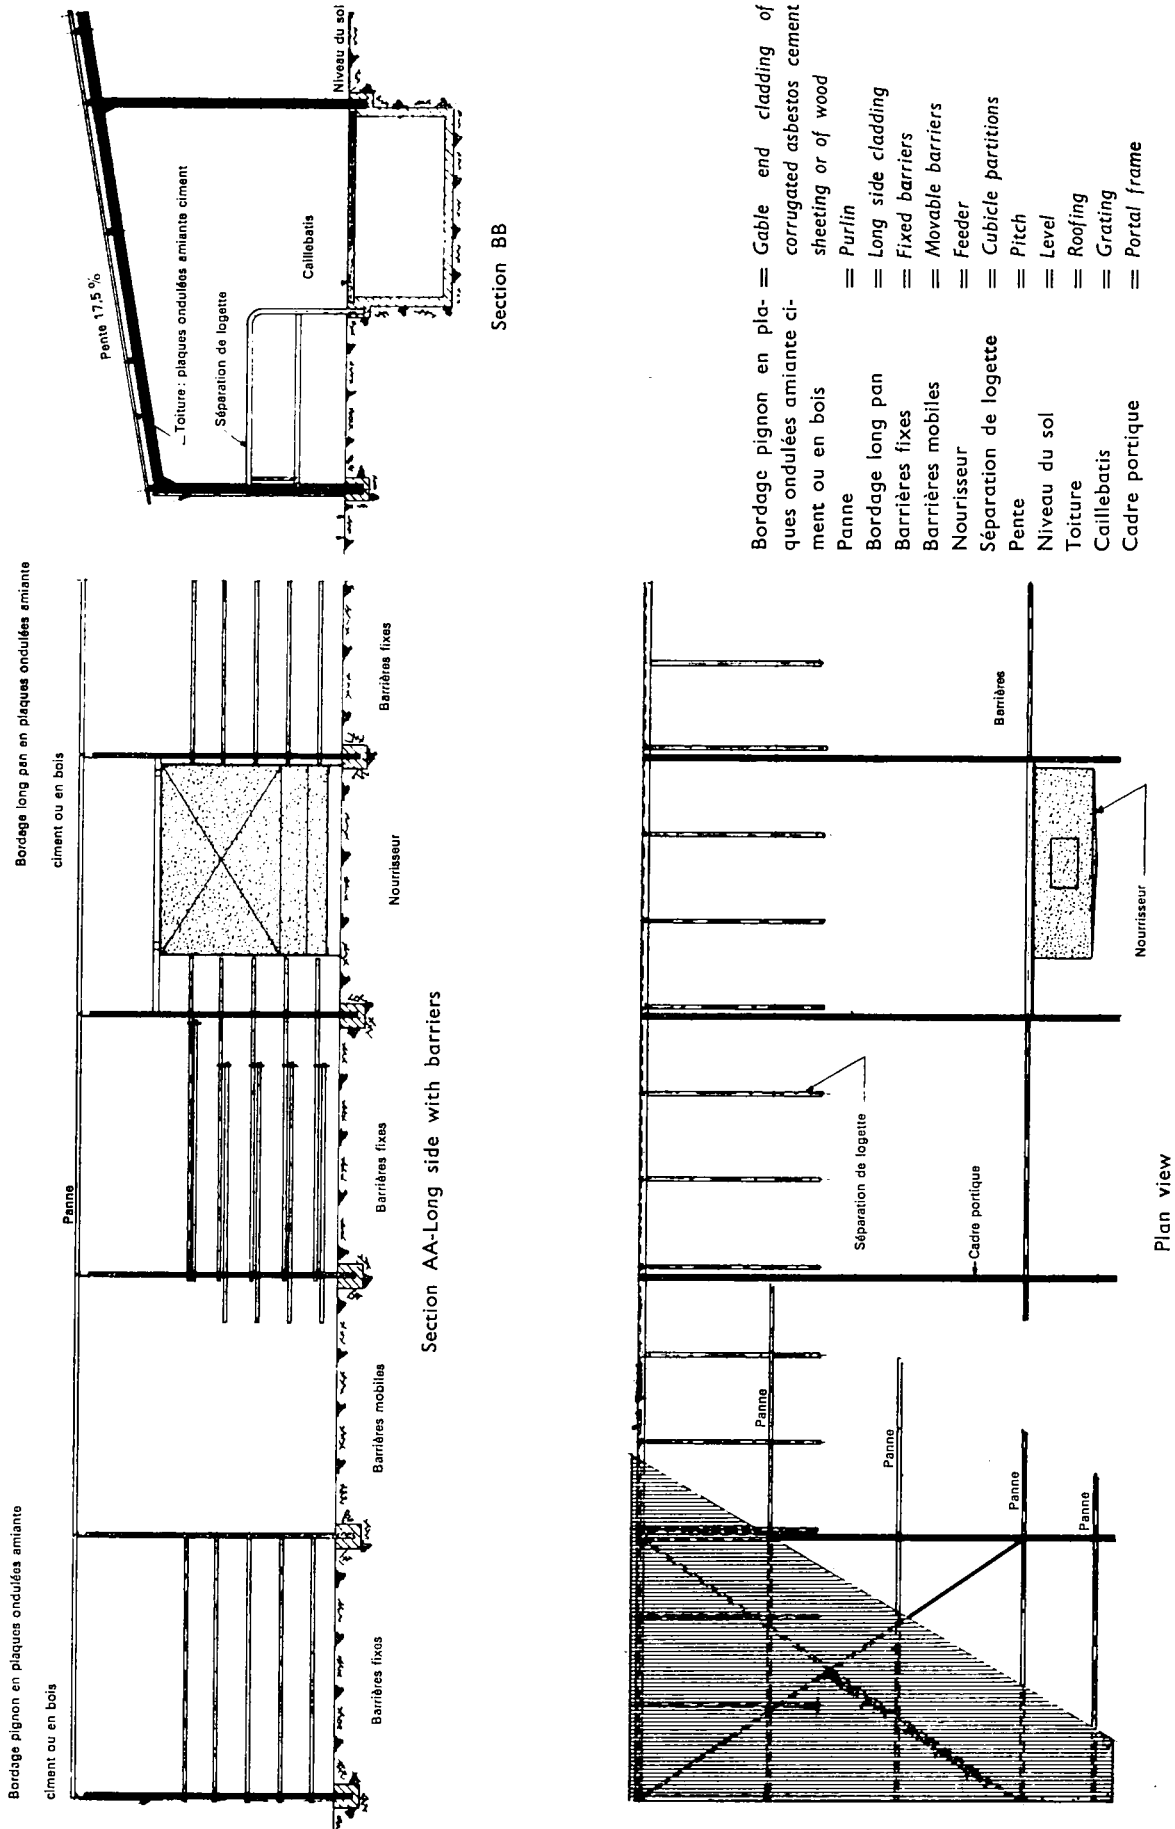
Open stall system—sheds—longitudinal and transverse sections
